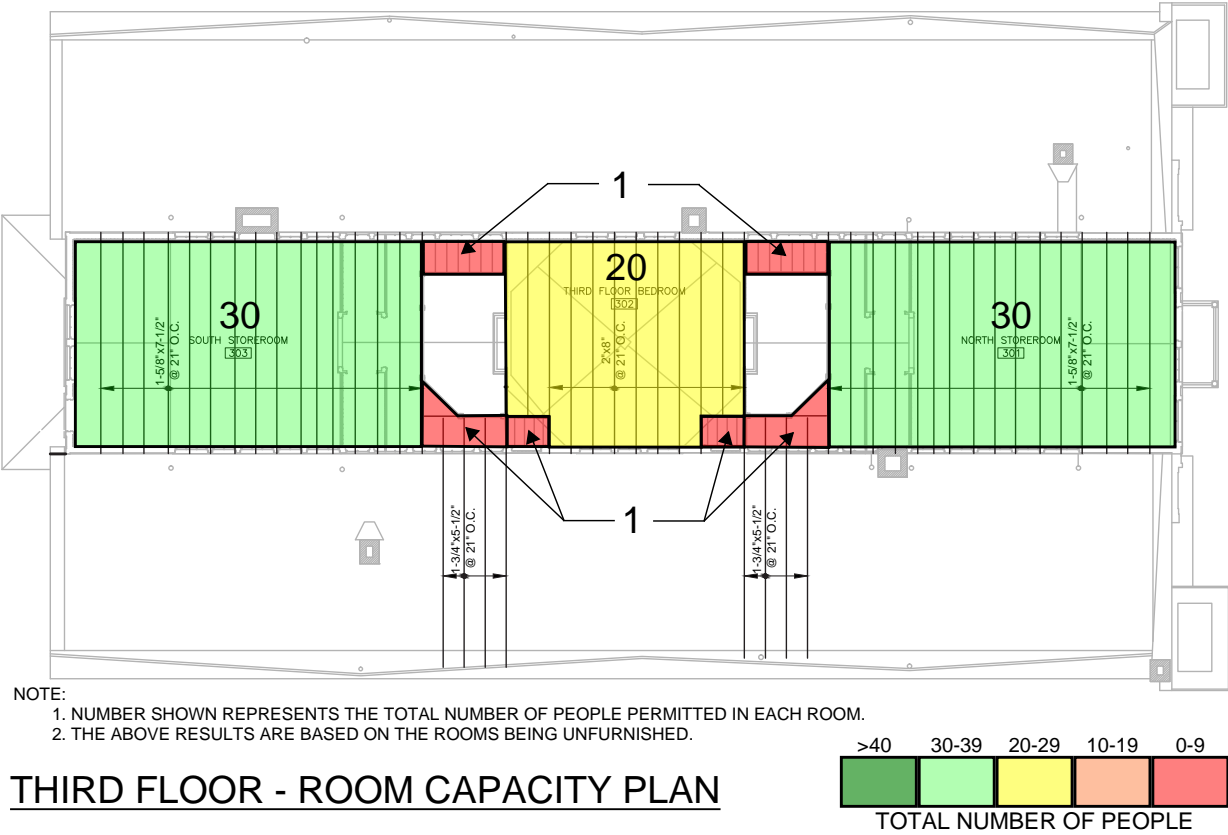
Unfurnished Room Capacity Plan - Third Floor
